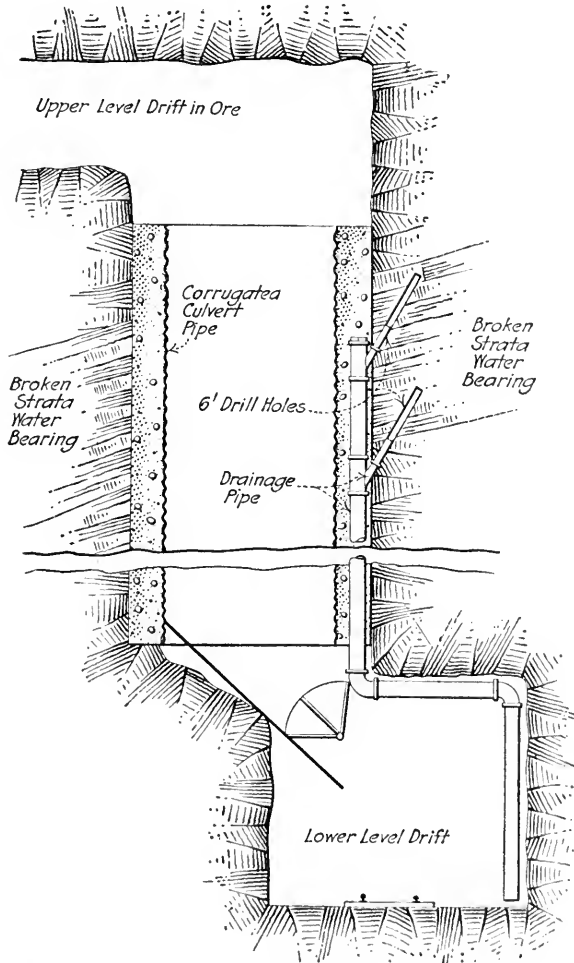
CONCRETE AND PIPES FOR DRAINING RAISE.
